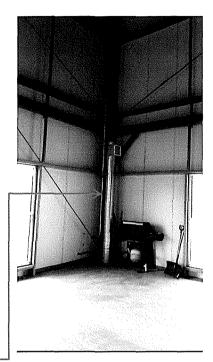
1207 Canal; typical warehouse space supply air duct, column E17.
